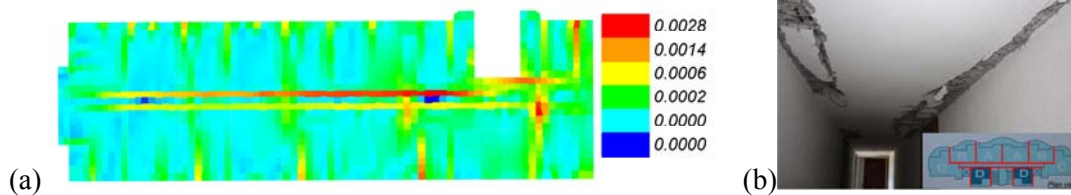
Effect of slab-wall coupling: (a) contour plot of maximum principal strain for the floor slab F12 at time step P_1 ; (b) damage at the slab-wall connections observed in a similar RC building (Courtesy of Dr. P. Dechent)
